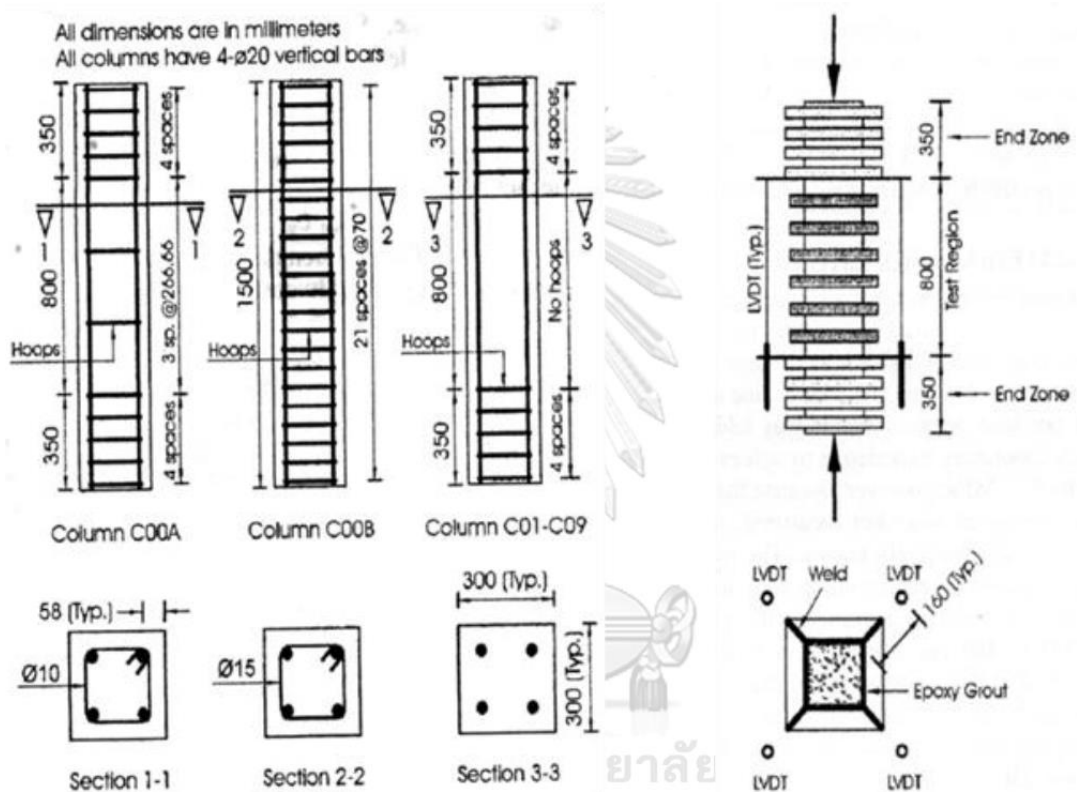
Typical test specimen and strengthening adopted by Hussain and Driver [44].
